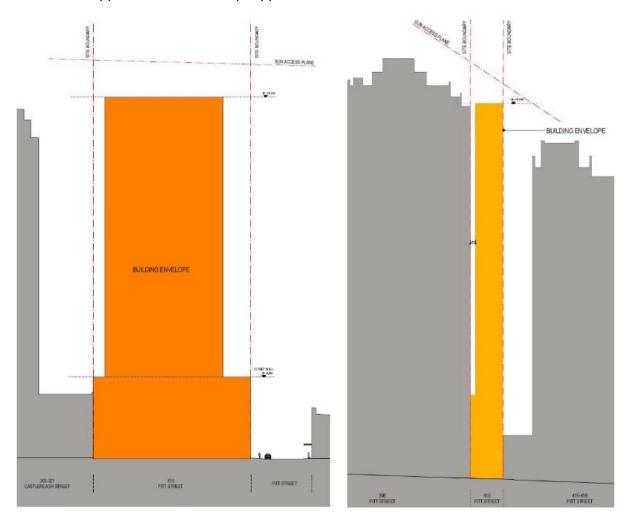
Approved concept building envelope drawings: north elevation (left), and north - south section (right)
